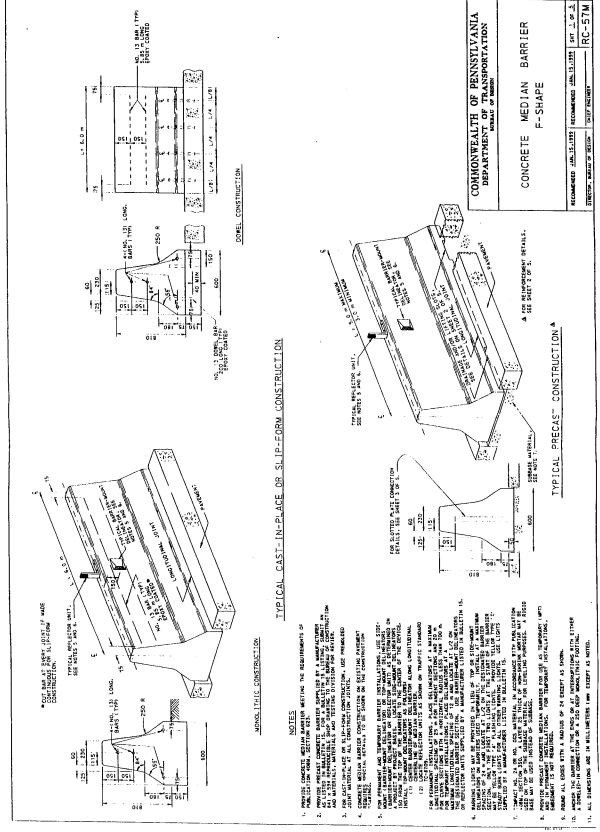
Detailed drawing of concrete median barrier F-shape (1 of 5).
